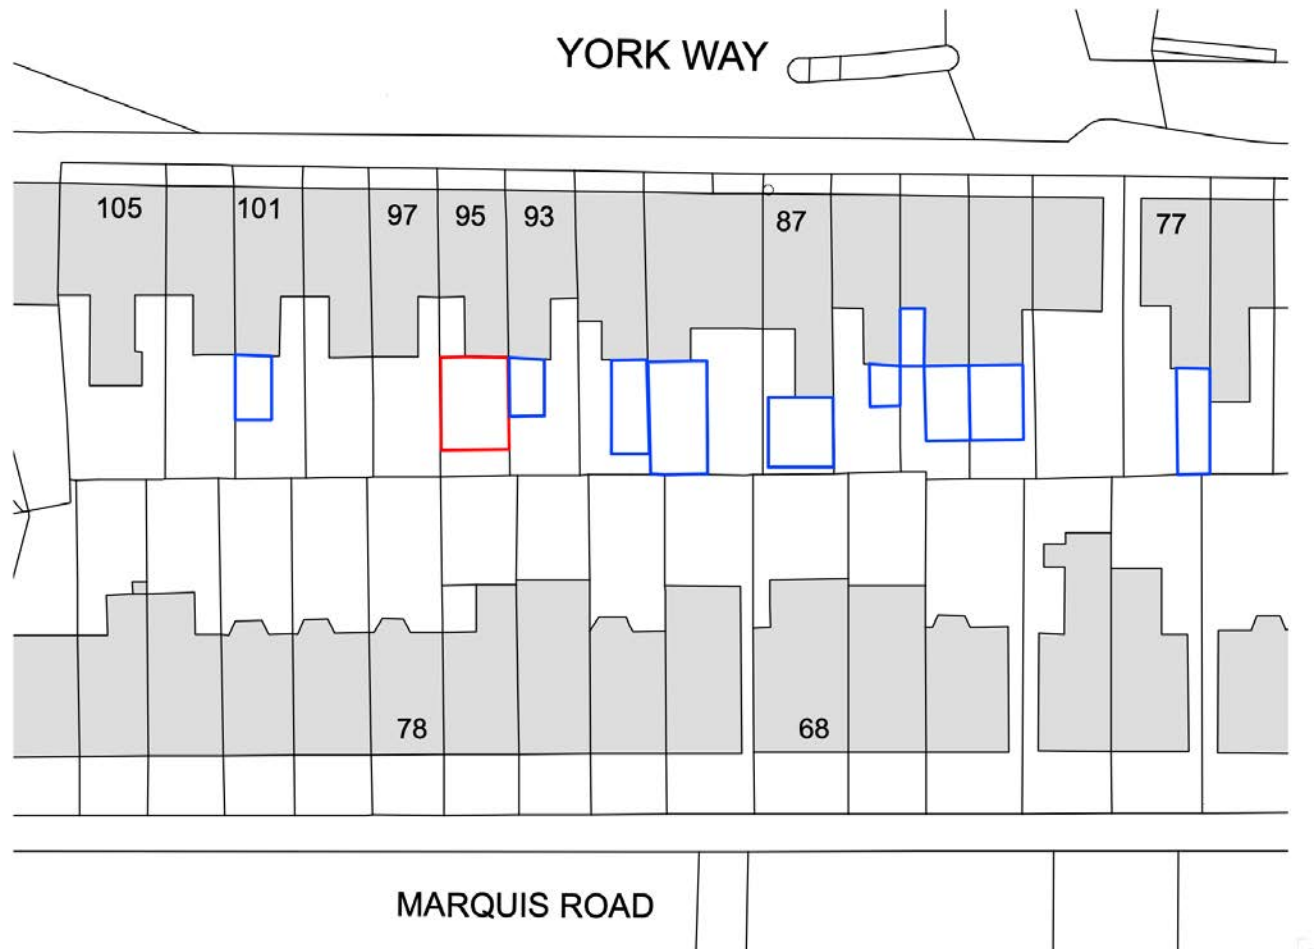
York way existing. Proposed extension to 95A shown in red, existing neighbouring extension shown in blue.
